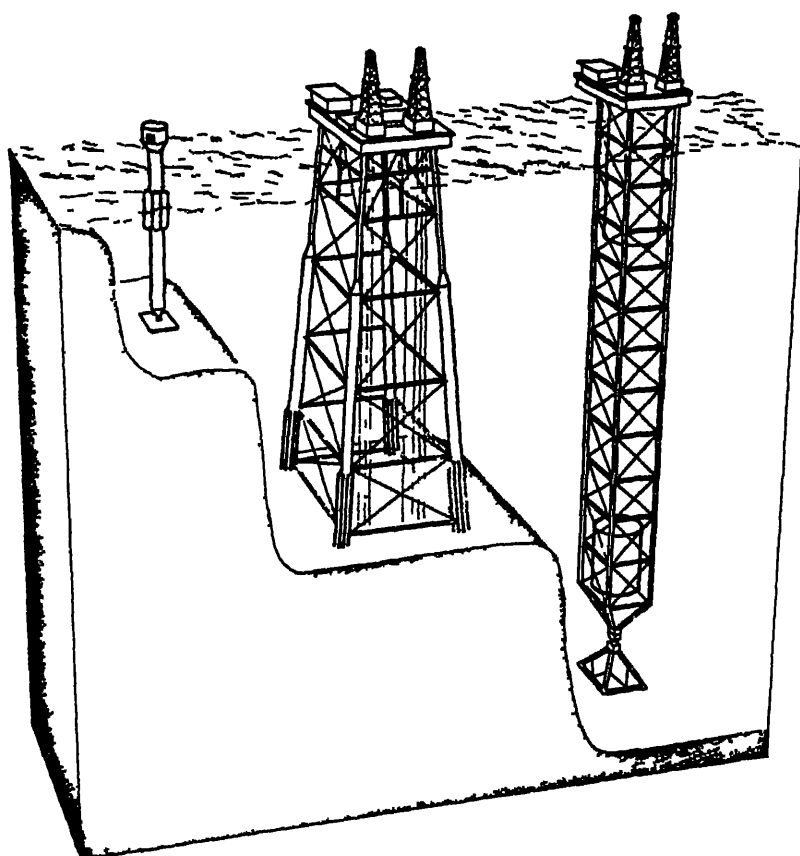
French test of buoyant tower in 325 feet of water, compared with Esso concept of 700-foot platform and 1350-foot tower.
